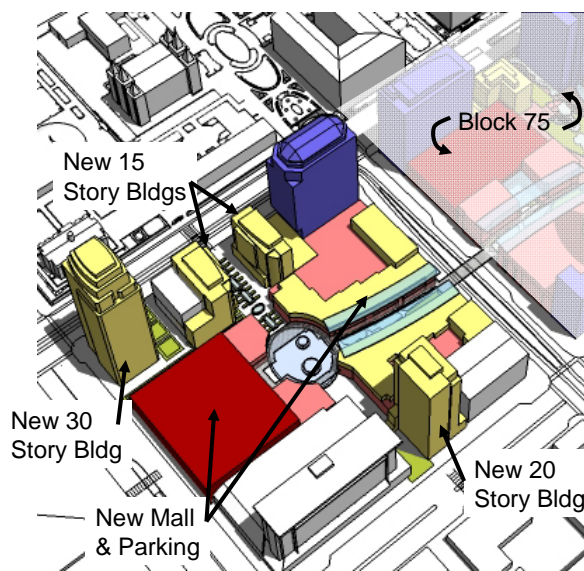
New Construction at Block 76 of the City Creek Center Project
